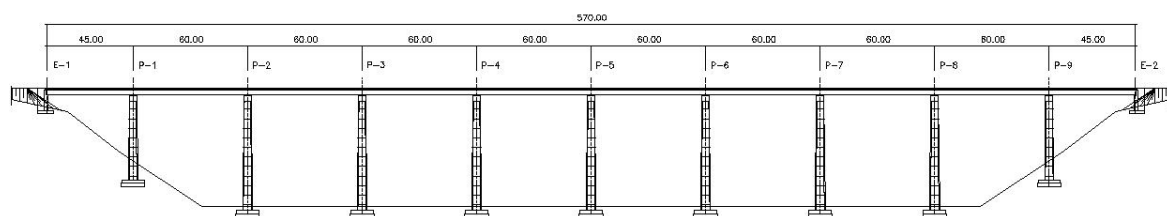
Typical elevation of a prestressed concrete railway viaduct
